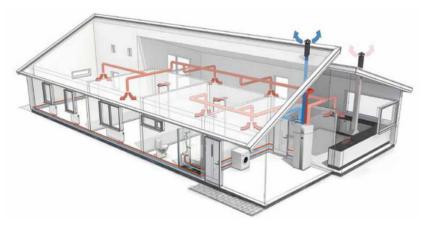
Typical Exhaust Air Heat Pump Installation
